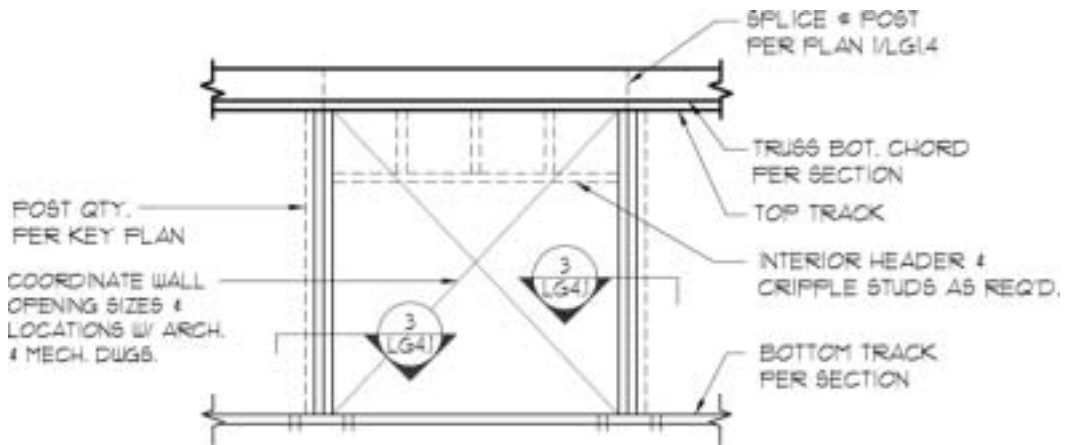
Typical interior light-gage bearing stud elevation at opening
